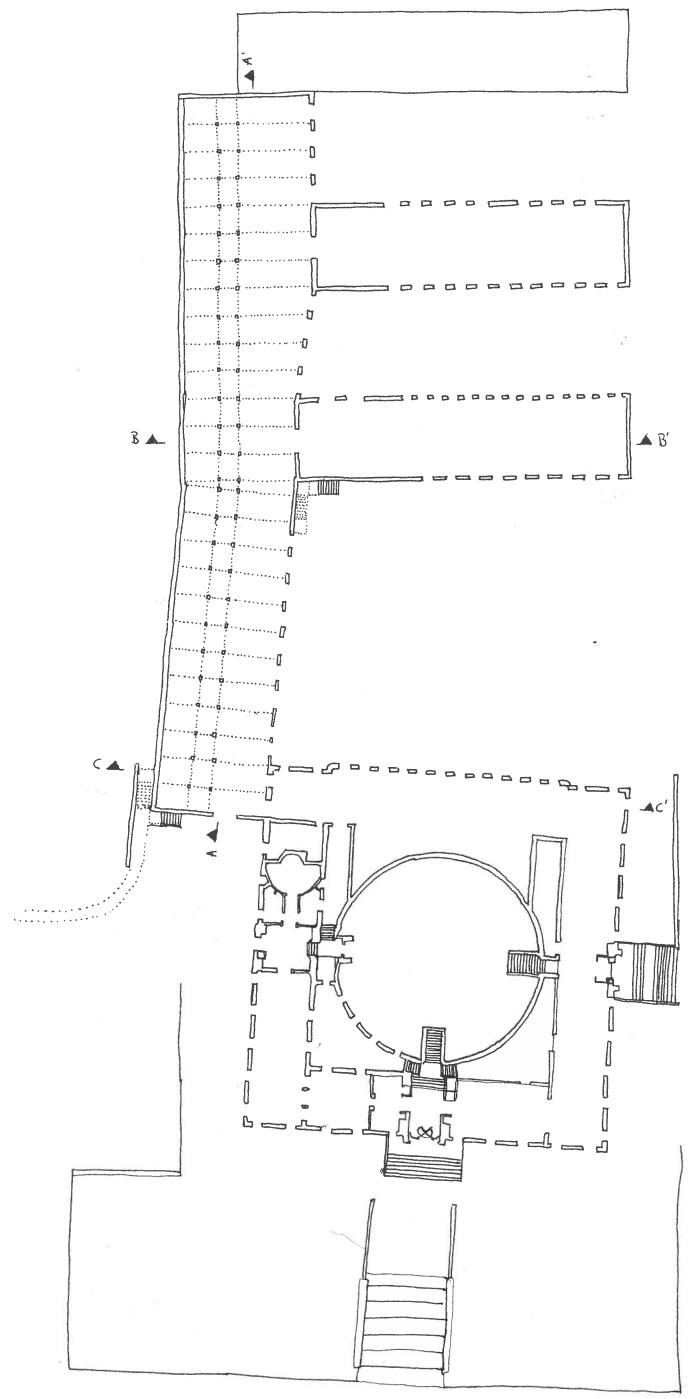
floor plan 1:1000, proposal pre p2 crit
